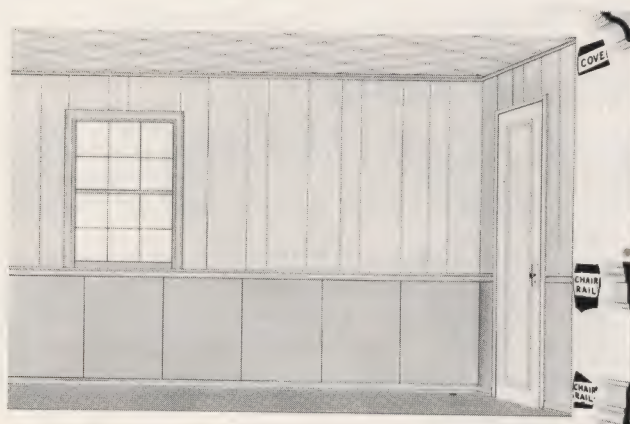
Design Suggestion, Using Kolor-Trim Moldings
